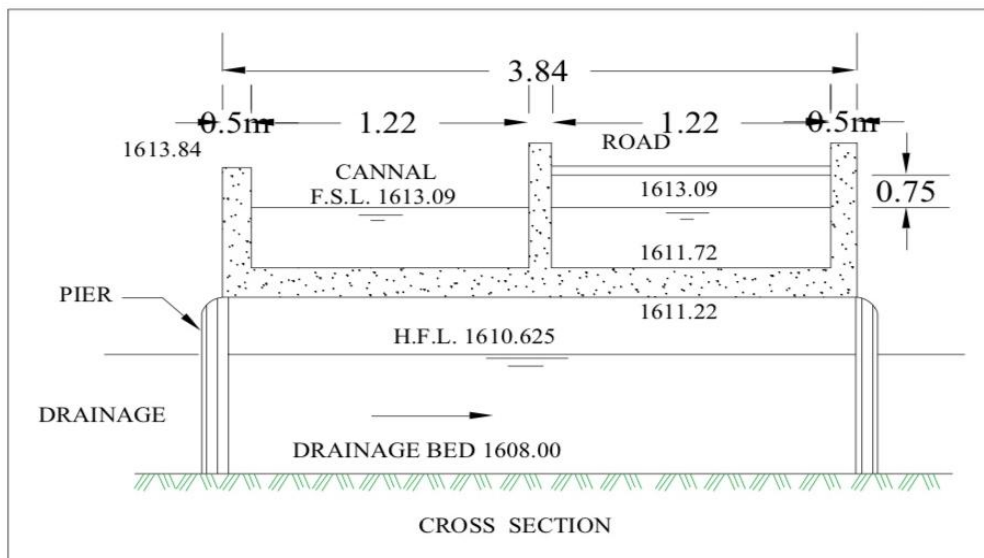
Cross section of Aqueduct at RD 4985 m
